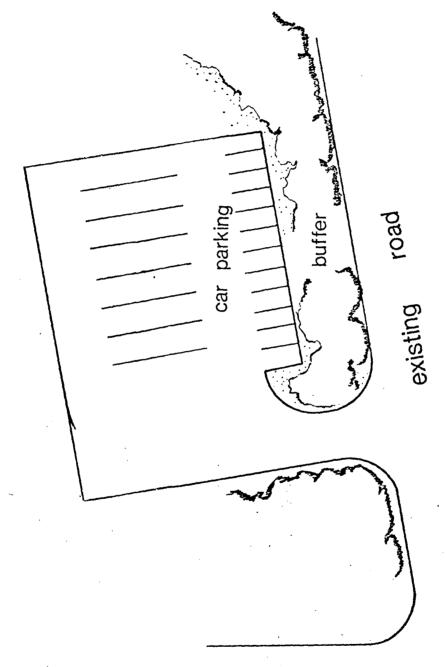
PARKING LOT TYPICAL PLAN VIEW
